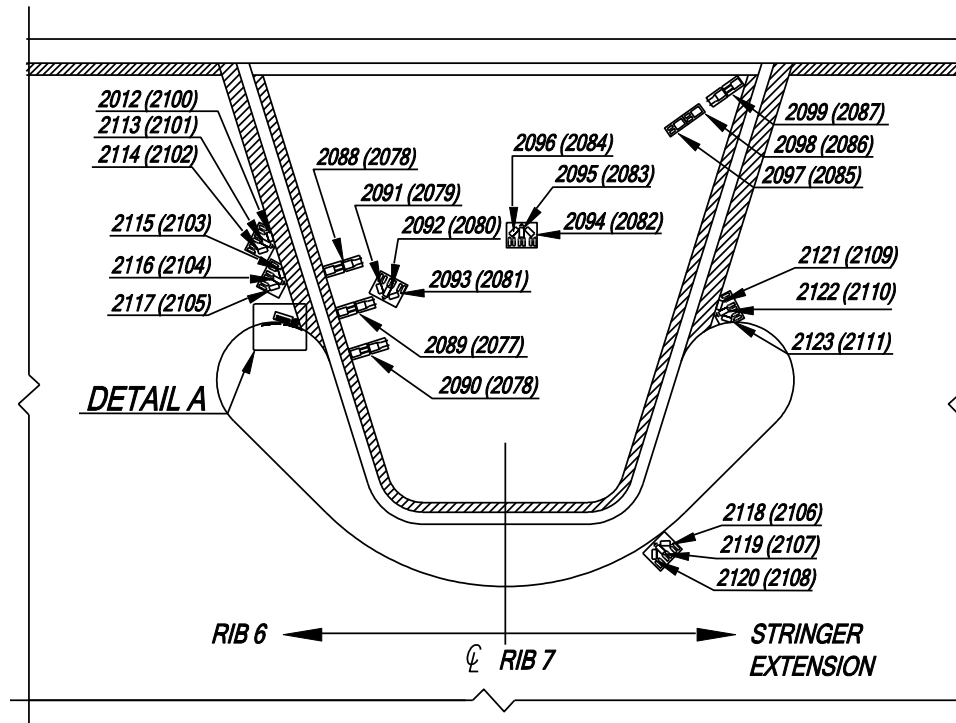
Detail instrumentation plan at Rib 7 – Detail F in Figure 78 (drawn by Alapati)
